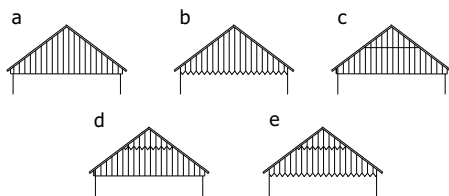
Clapboard pattern separating the gable from the house wall: a, b - a single overhang; c, d, e - a double overhang; b, d, e - a gable finished up with a decorative detail (the so-called 'fartuszek')
